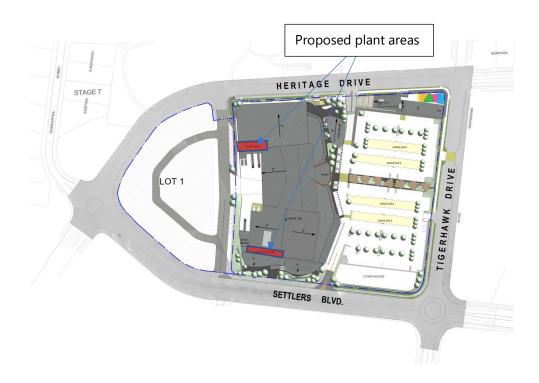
Site Plan Including Proposed Rooftop Plant Locations
